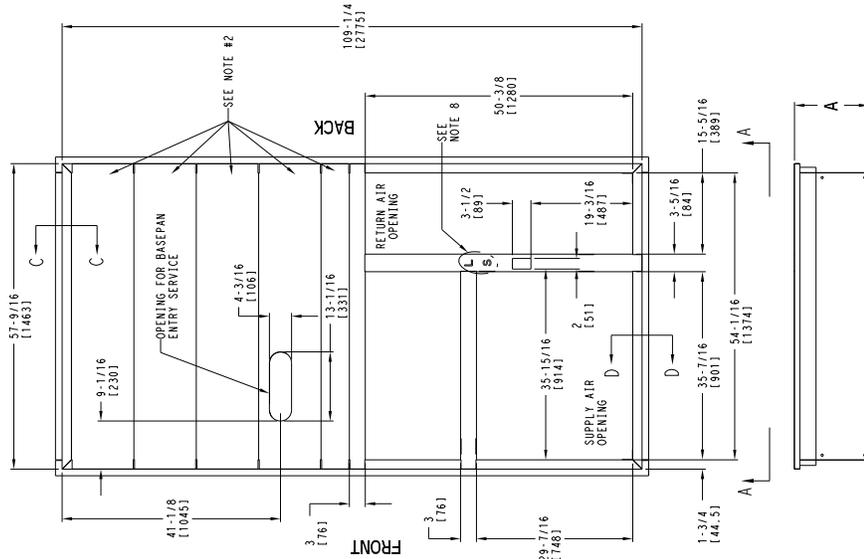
50HCQ\*\*07, 08, 09 Roof Curb Accessory Details
